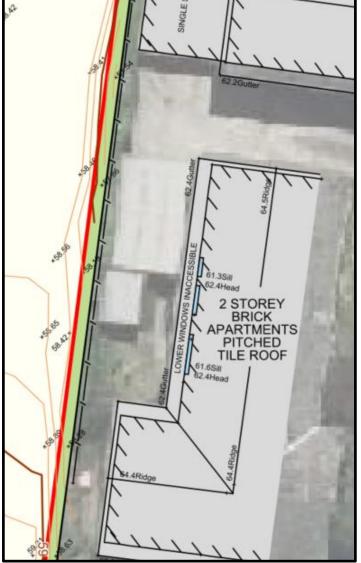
31 Barnsbury Road Group 1 First Floor Windows
